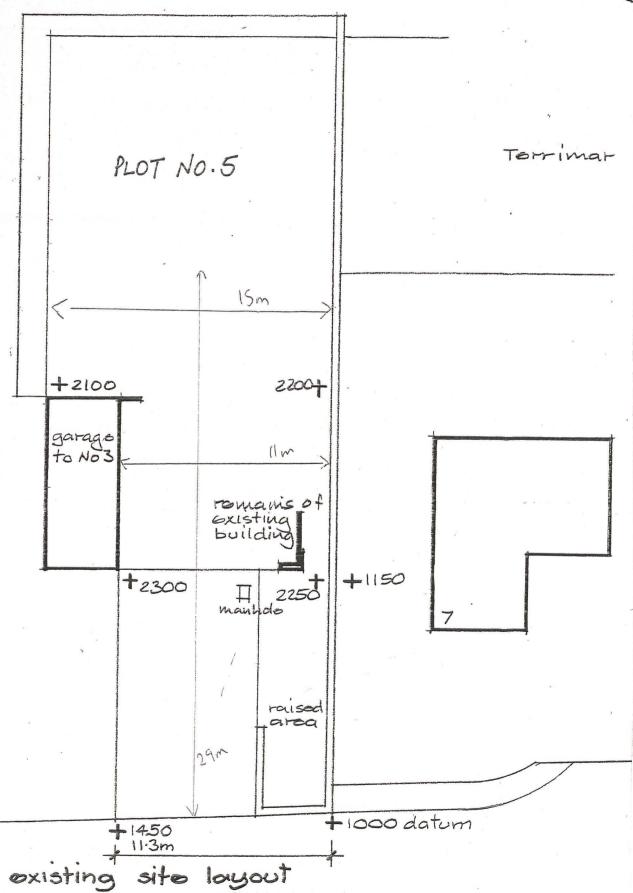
Plot no.5, South Rise, Binbrook: Existing layout of site (Architect's Plan, scale 1:200)
